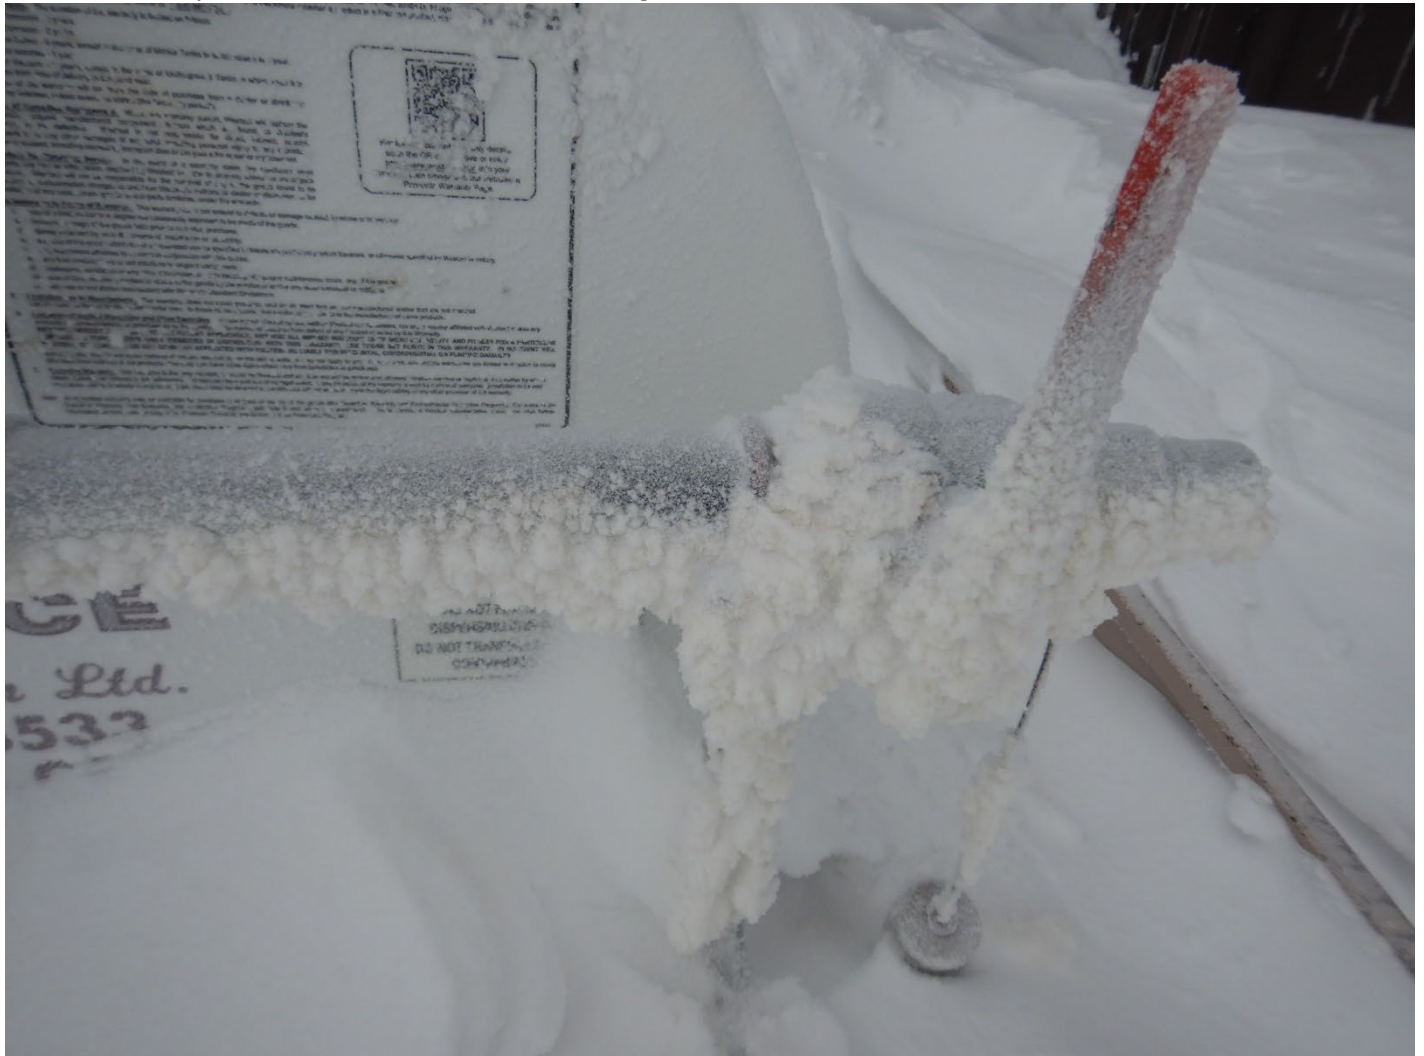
Misery surface - Bulk diesel fuel tank – Clean-up and inspection required.
